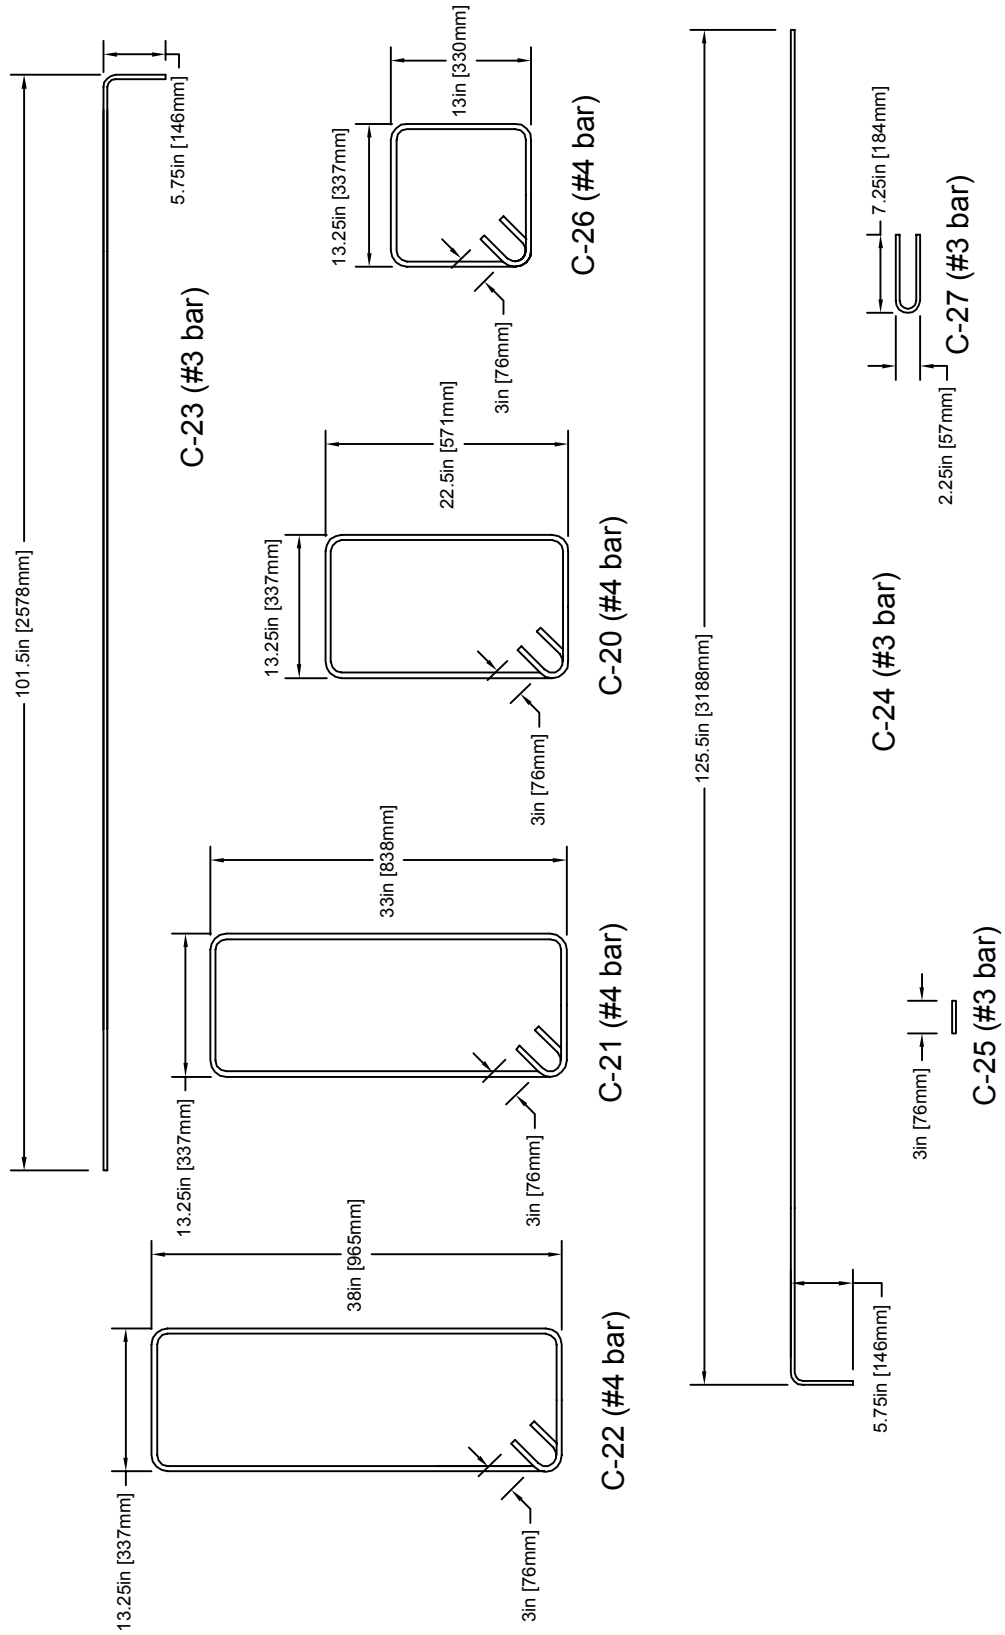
Bridge Plans Sheet 21; Steel Details 3.
